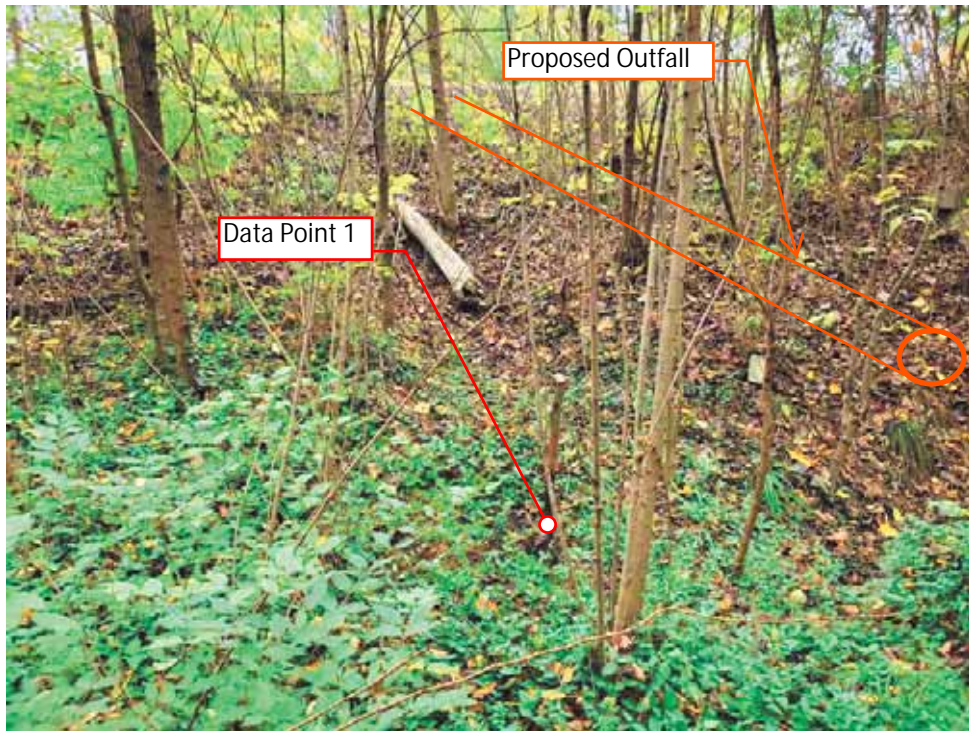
Investigation Area 1; Data Point 1 (non-wetland); looking west towards US 31 and the proposed new storm water outfall structure
